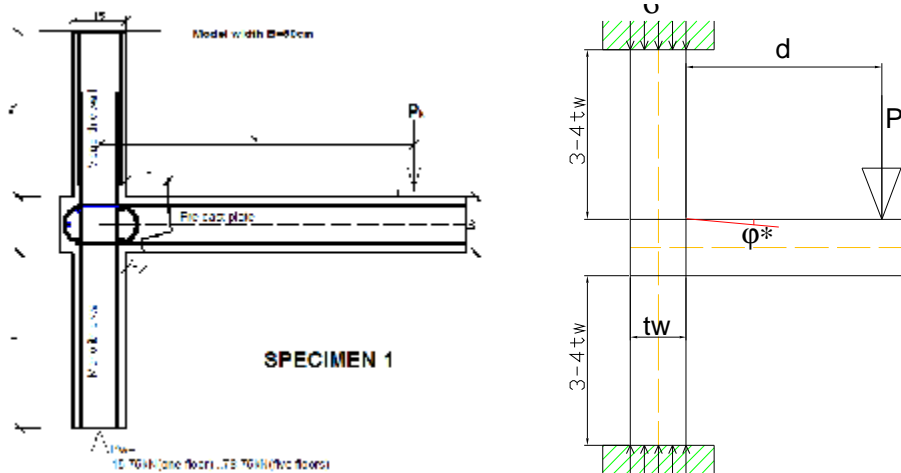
Specimen with precast slab and monolithic wall Fig. 4. Adopted geometric relationship after [31]
